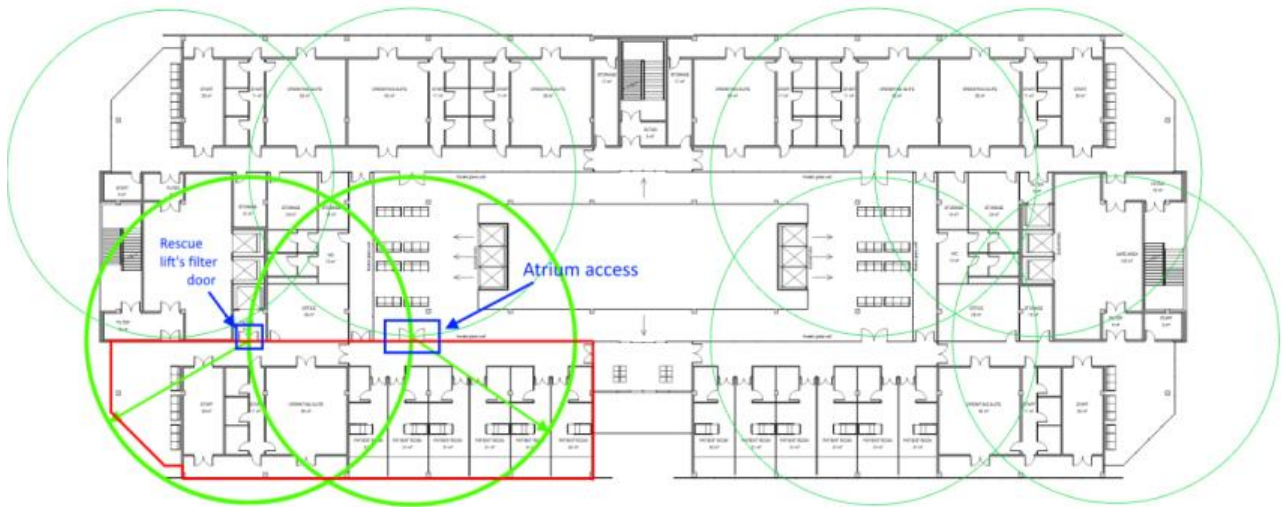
Fire brigade access on the 5<sup>th</sup> floor
